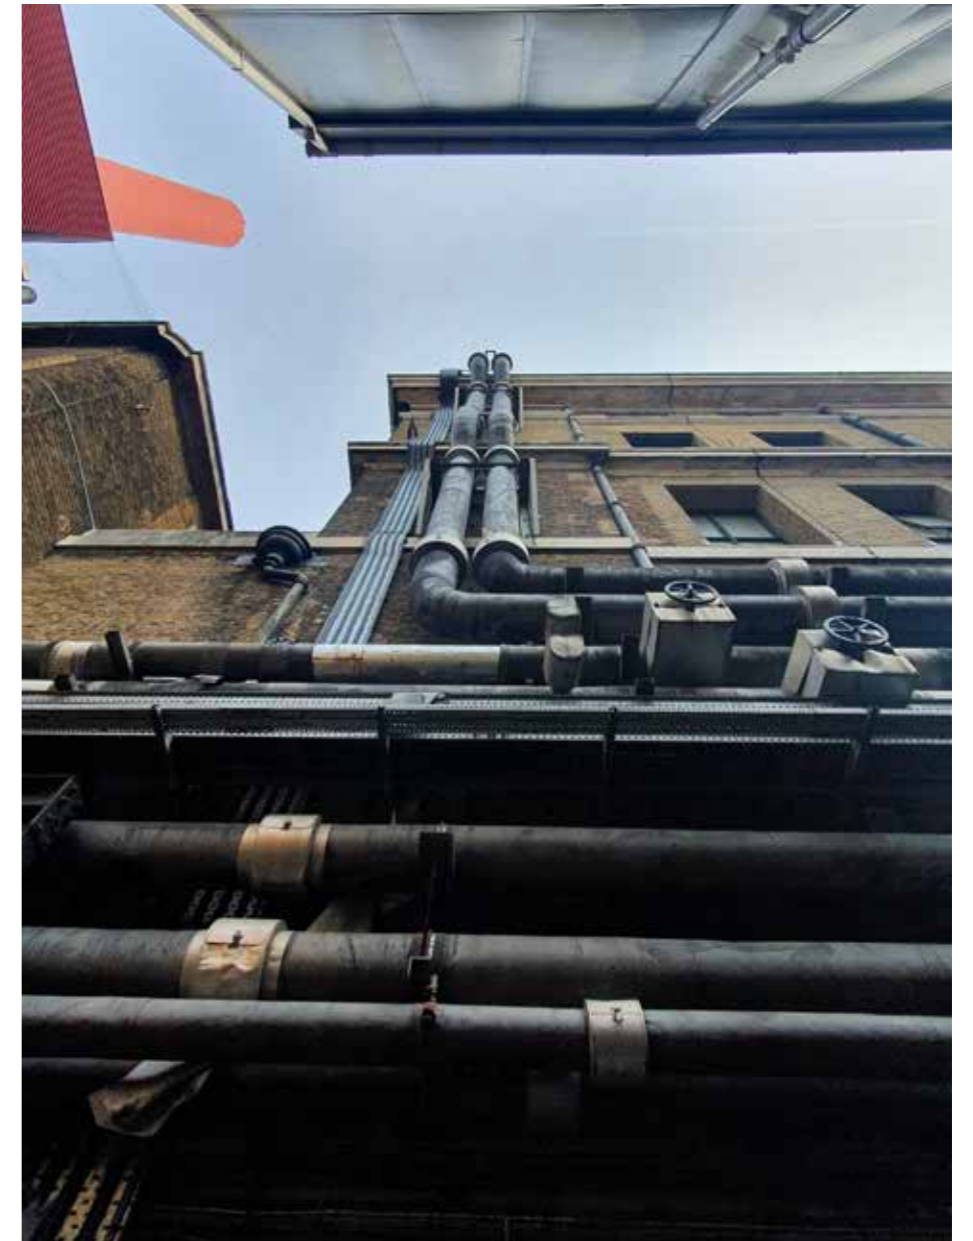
View looking up the west elevation of the Lycian building, showing the extent of ducting to the façade
